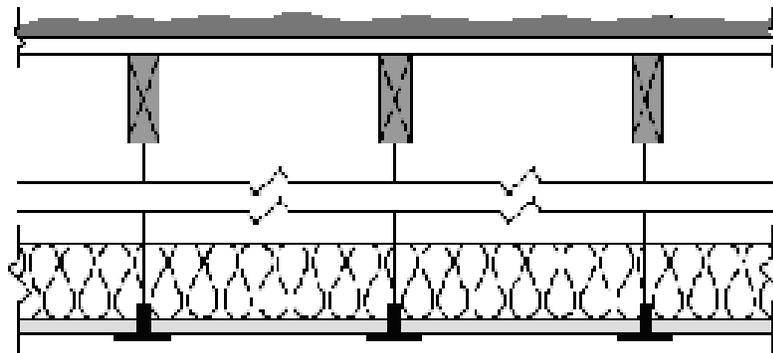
Insulated Ceiling with Removable Panels
